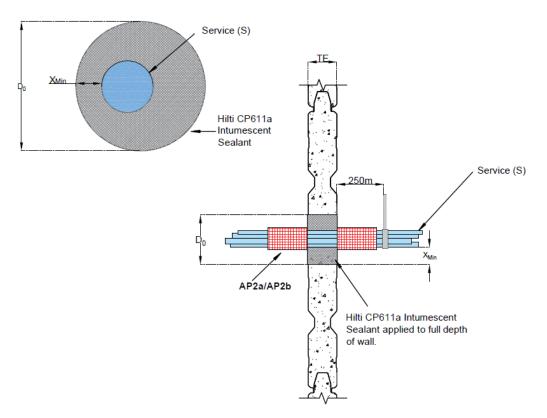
Cables bundles through 78 mm thick Korok panels with additional AP2 protection
